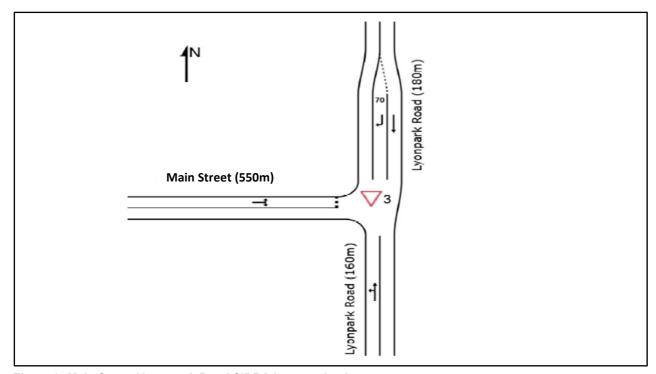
Main Street / Lyonpark Road SIDRA Intersection Layout
